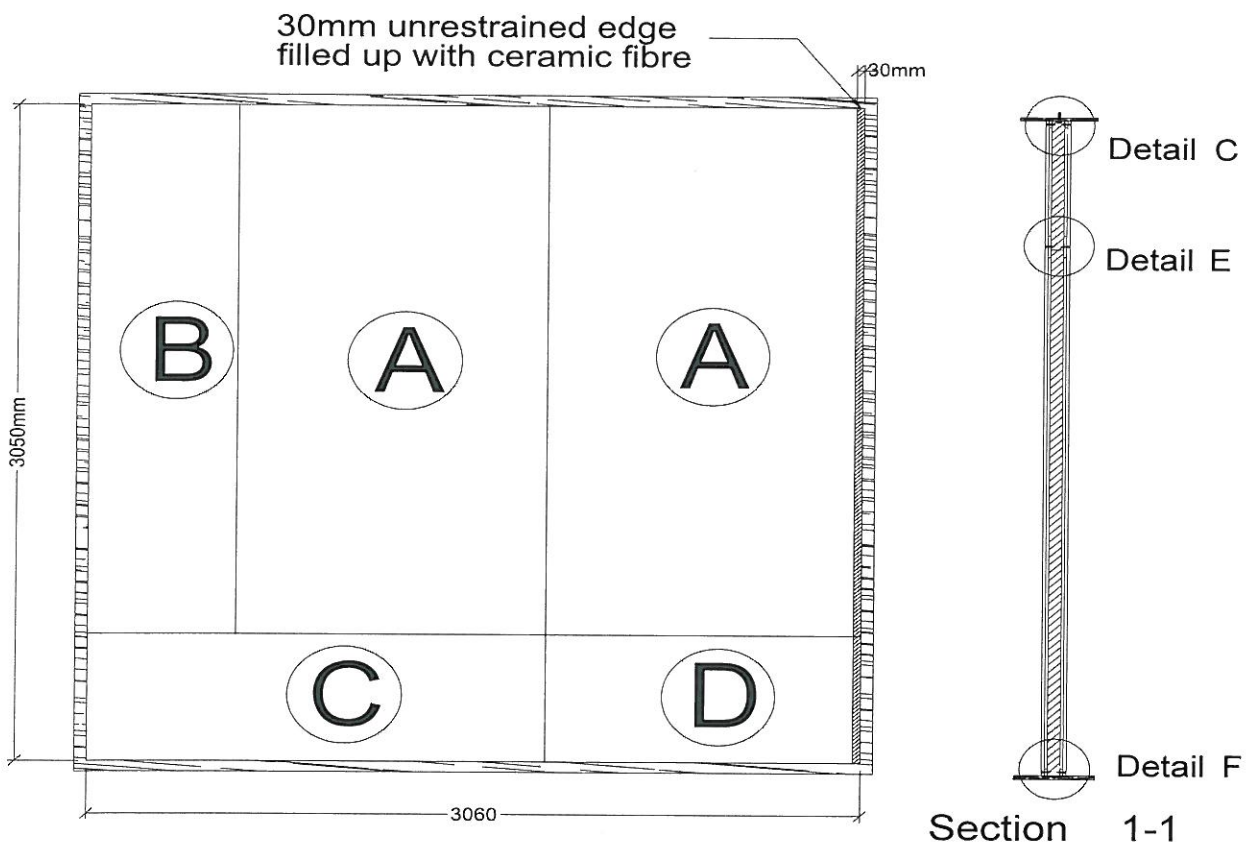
Elevation of the Unexposed Surface of the Specimen
